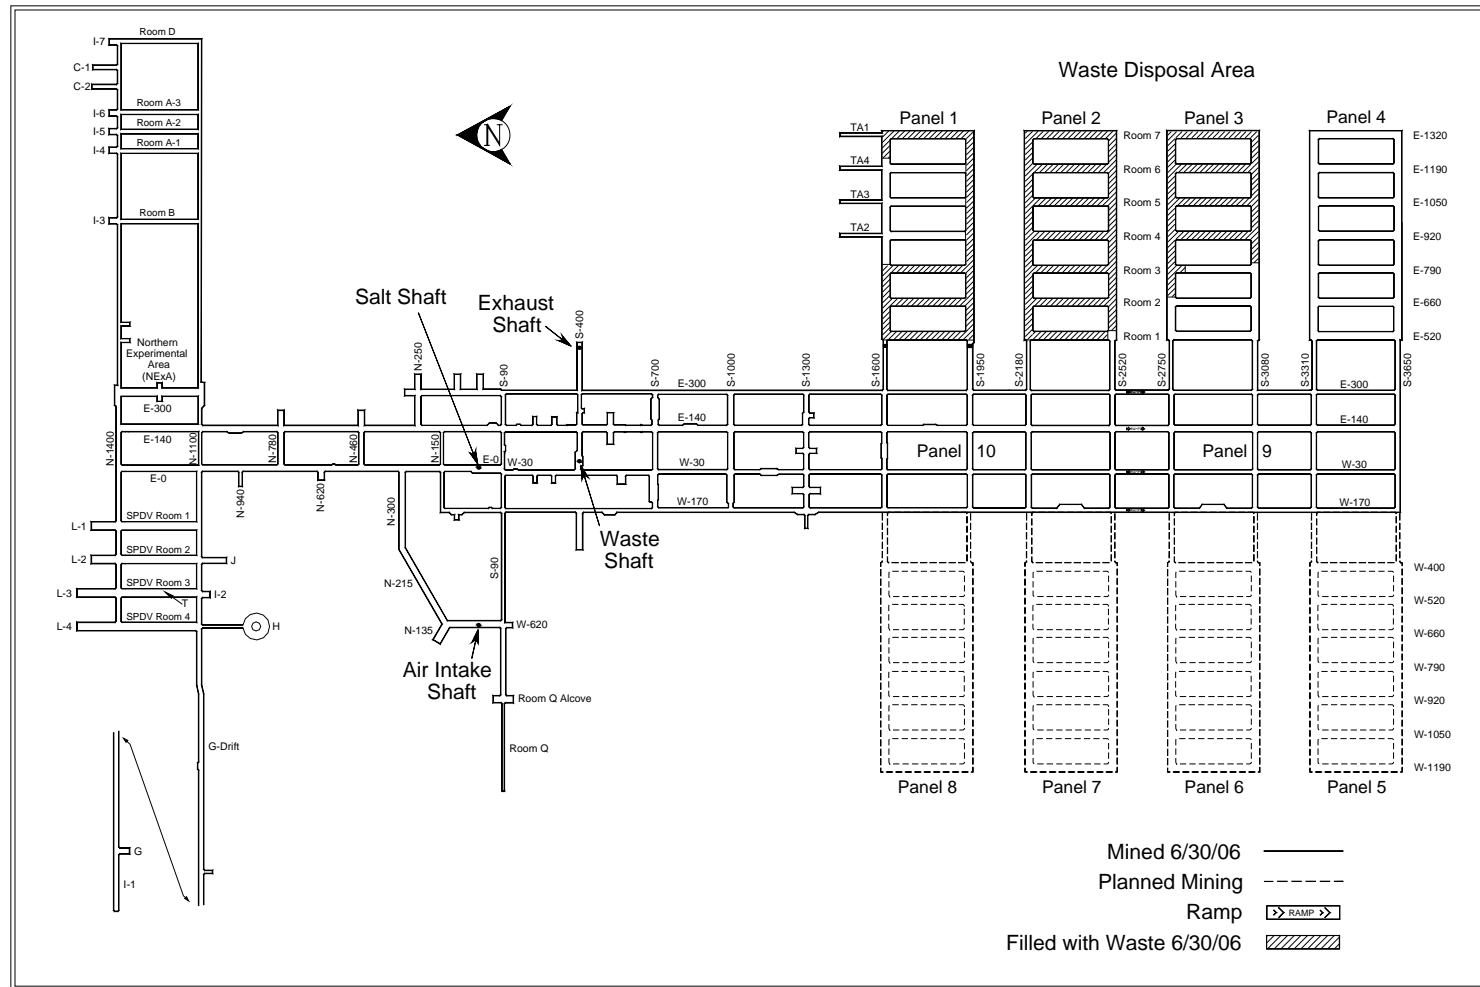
Underground Mining and Waste Disposal Configuration as of 6/30/06
